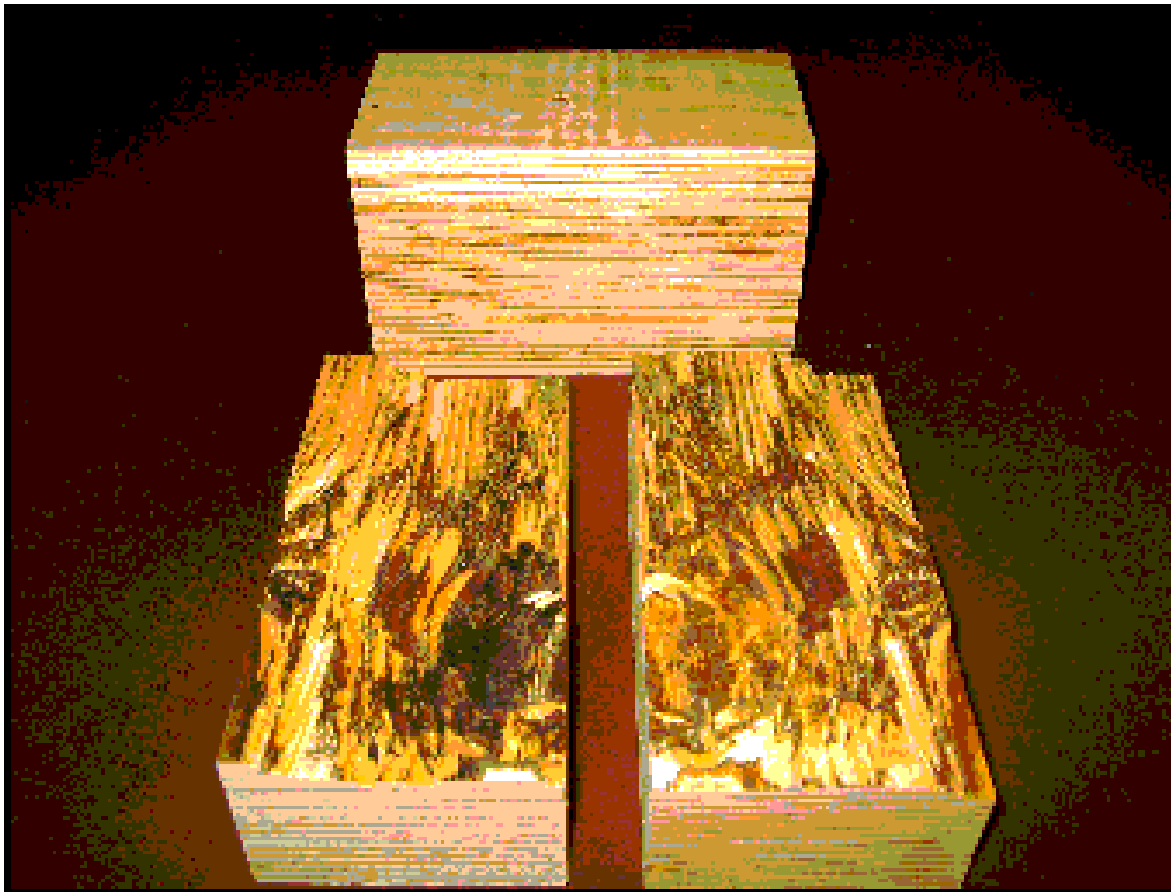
KNOTS & WOOD FAILURE-SHORT SPAN BENDING SHEAR TEST (3 ½ INCH LVL PRESSED FOR 34 MIN.)
